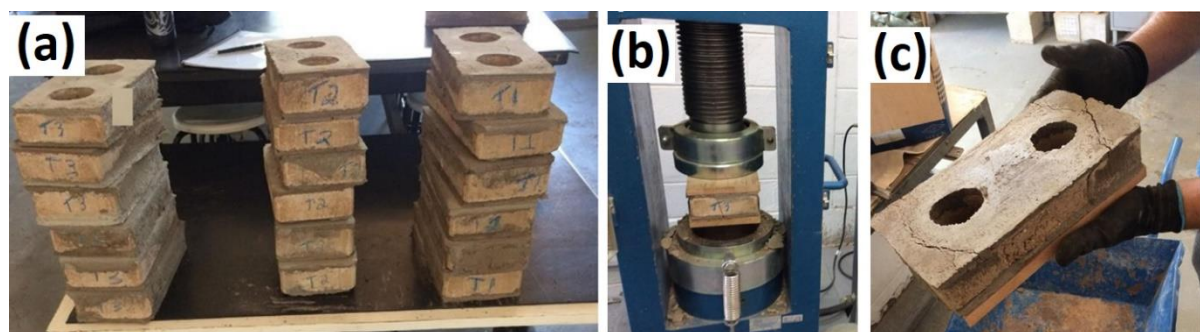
(a) Identified and capped bricks, (b) Pressing the brick using a hydraulic press, and (c) Cracks caused after rupture.
